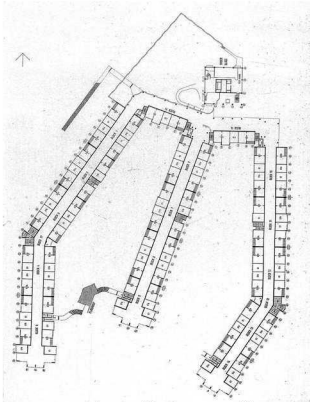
Original drawing of the lower ground floor showing garages and walled garden on north
